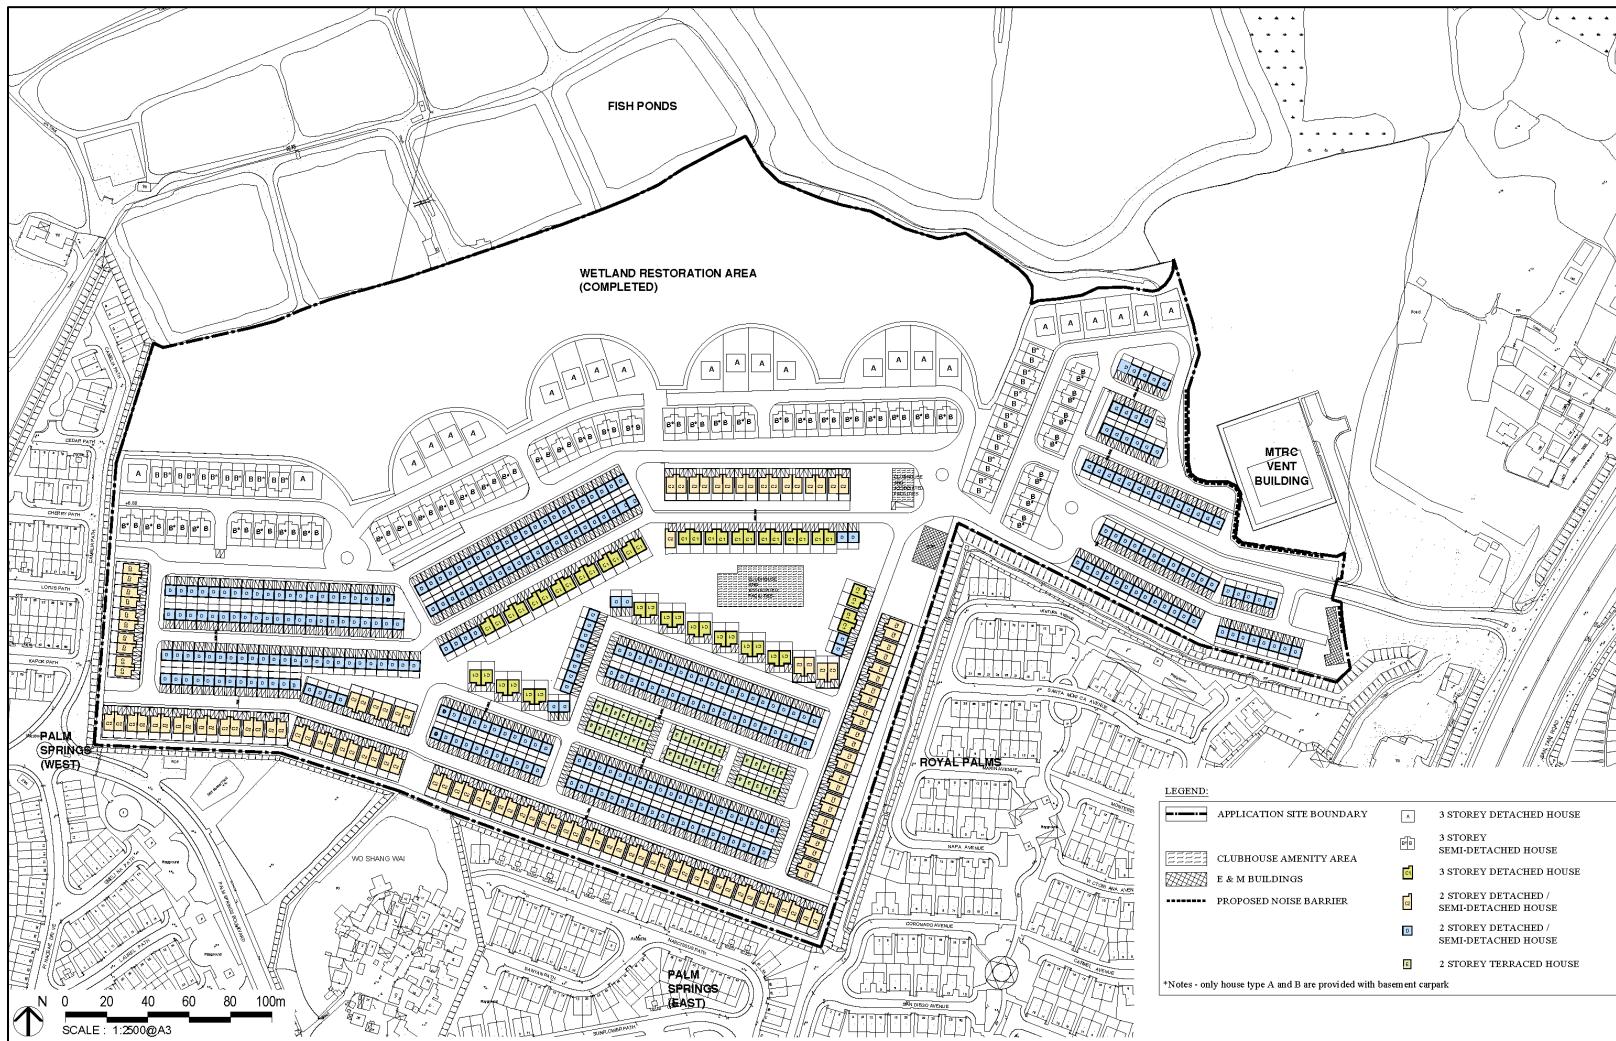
Revised Master Layout Plan of the Proposed Scheme
